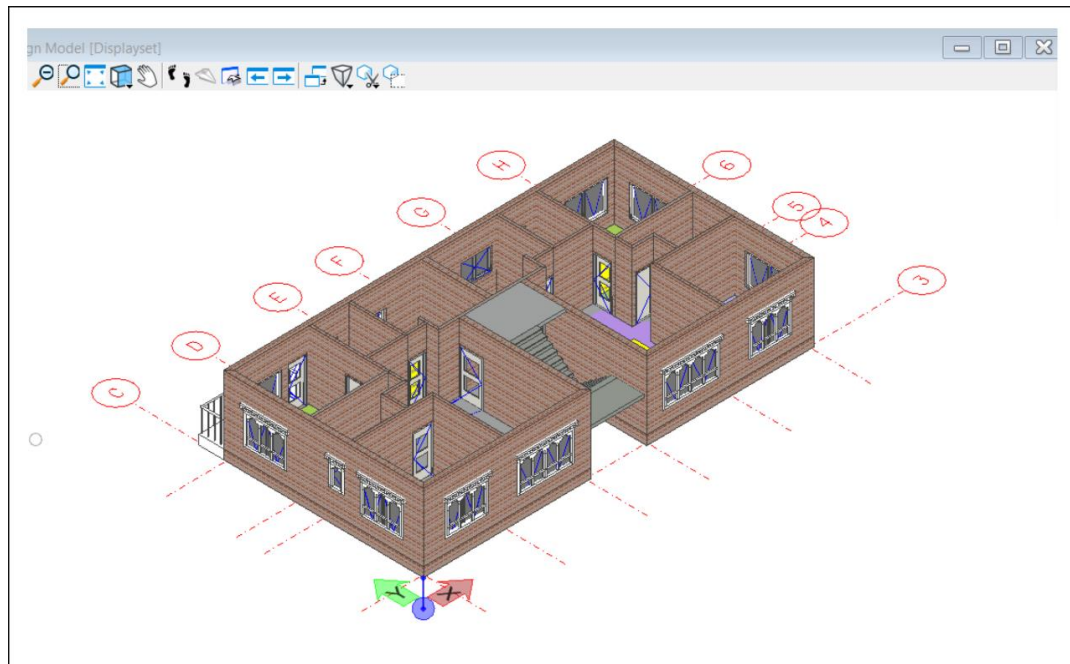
External Wall and Partition Wall Created in Open Building Designer
